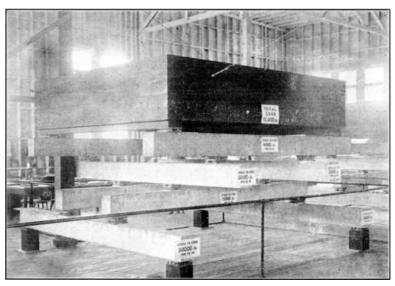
Arrangement of Static Load Test for Reinforced Concrete Beams.
